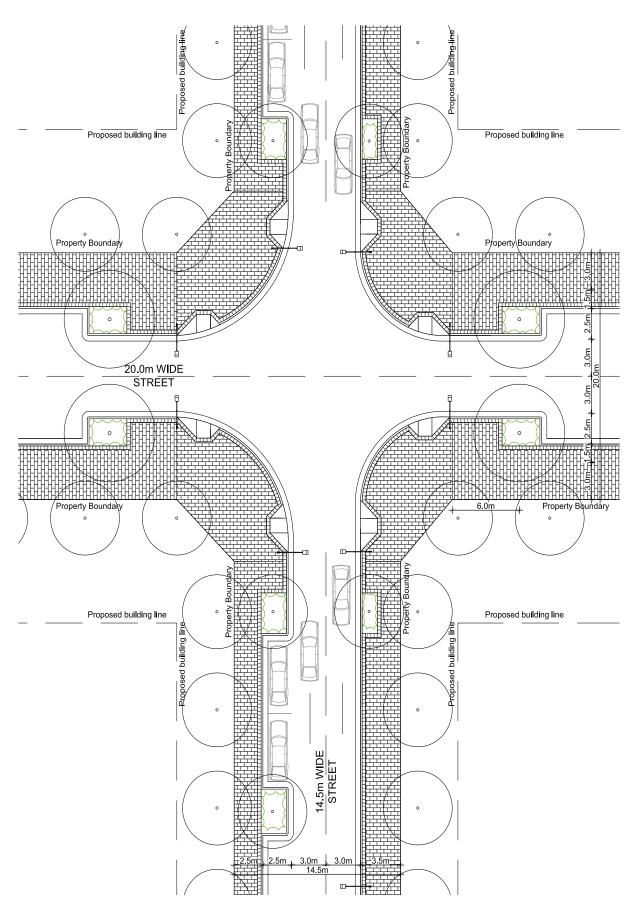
Typical Layout - 14.5-metre and 20-metre wide street intersection (NOT TO SCALE)
